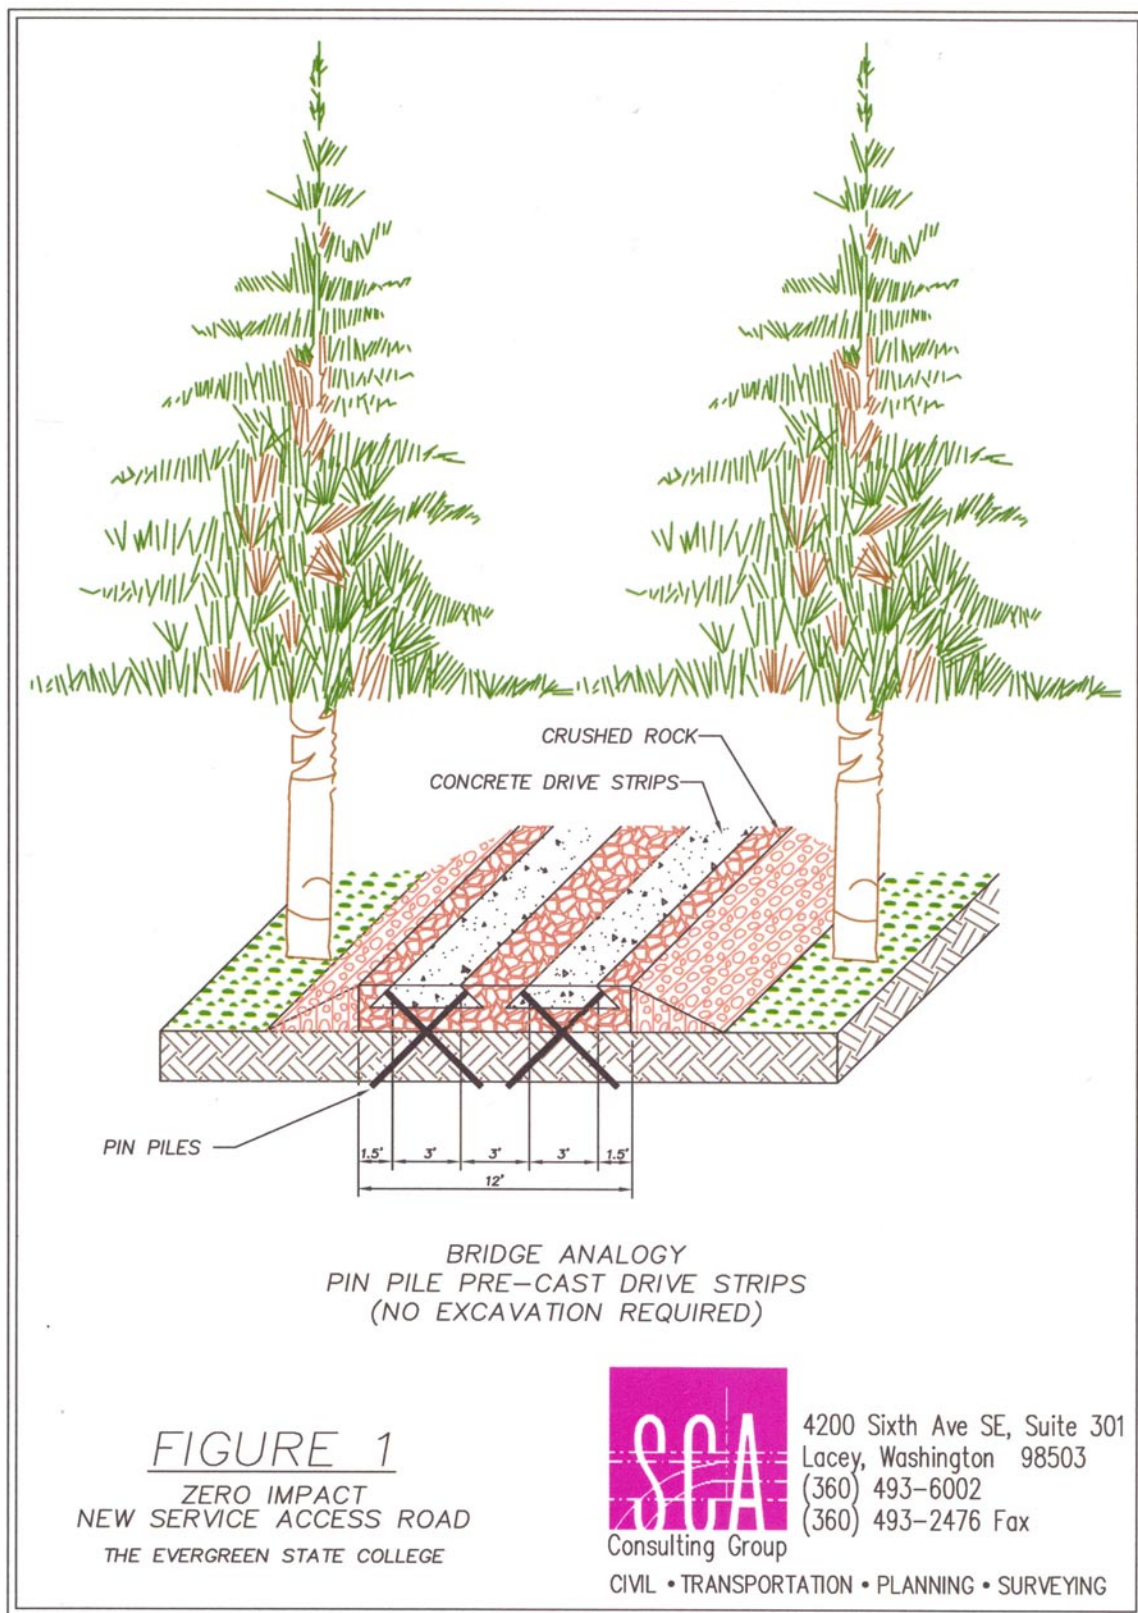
Low volume road partially supported by piles needs little or no excavation in its construction.
